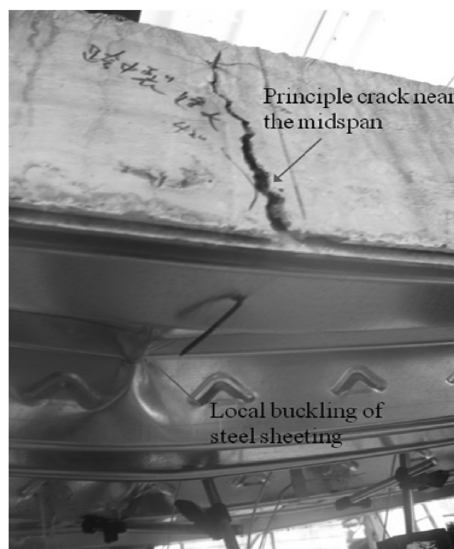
concrete crack and local buckling of steel sheeting
